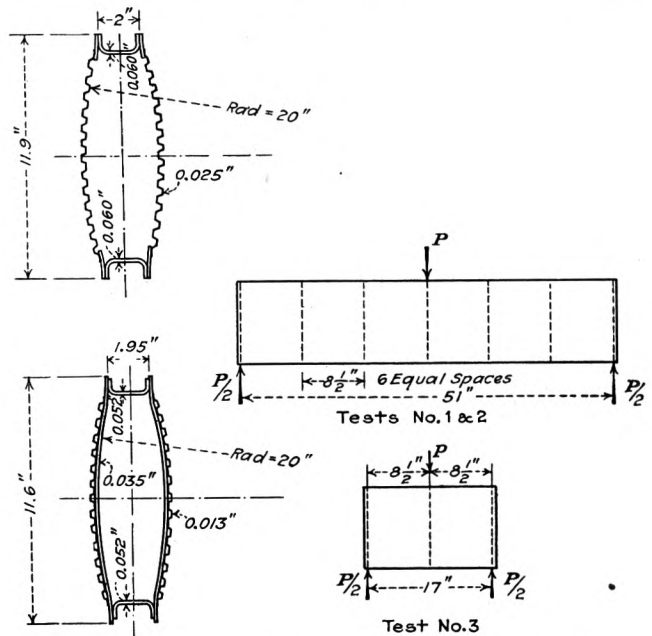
SPECIMENS FOR SHEAR AND BENDING TESTS
